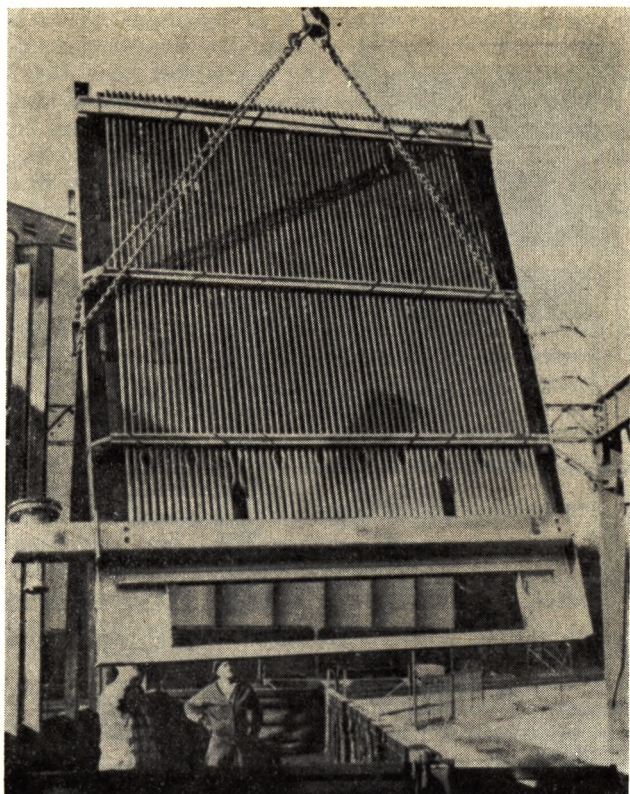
Inlet header and furnace rear-wall assembly for a field-erected high-temperature-water boiler.
